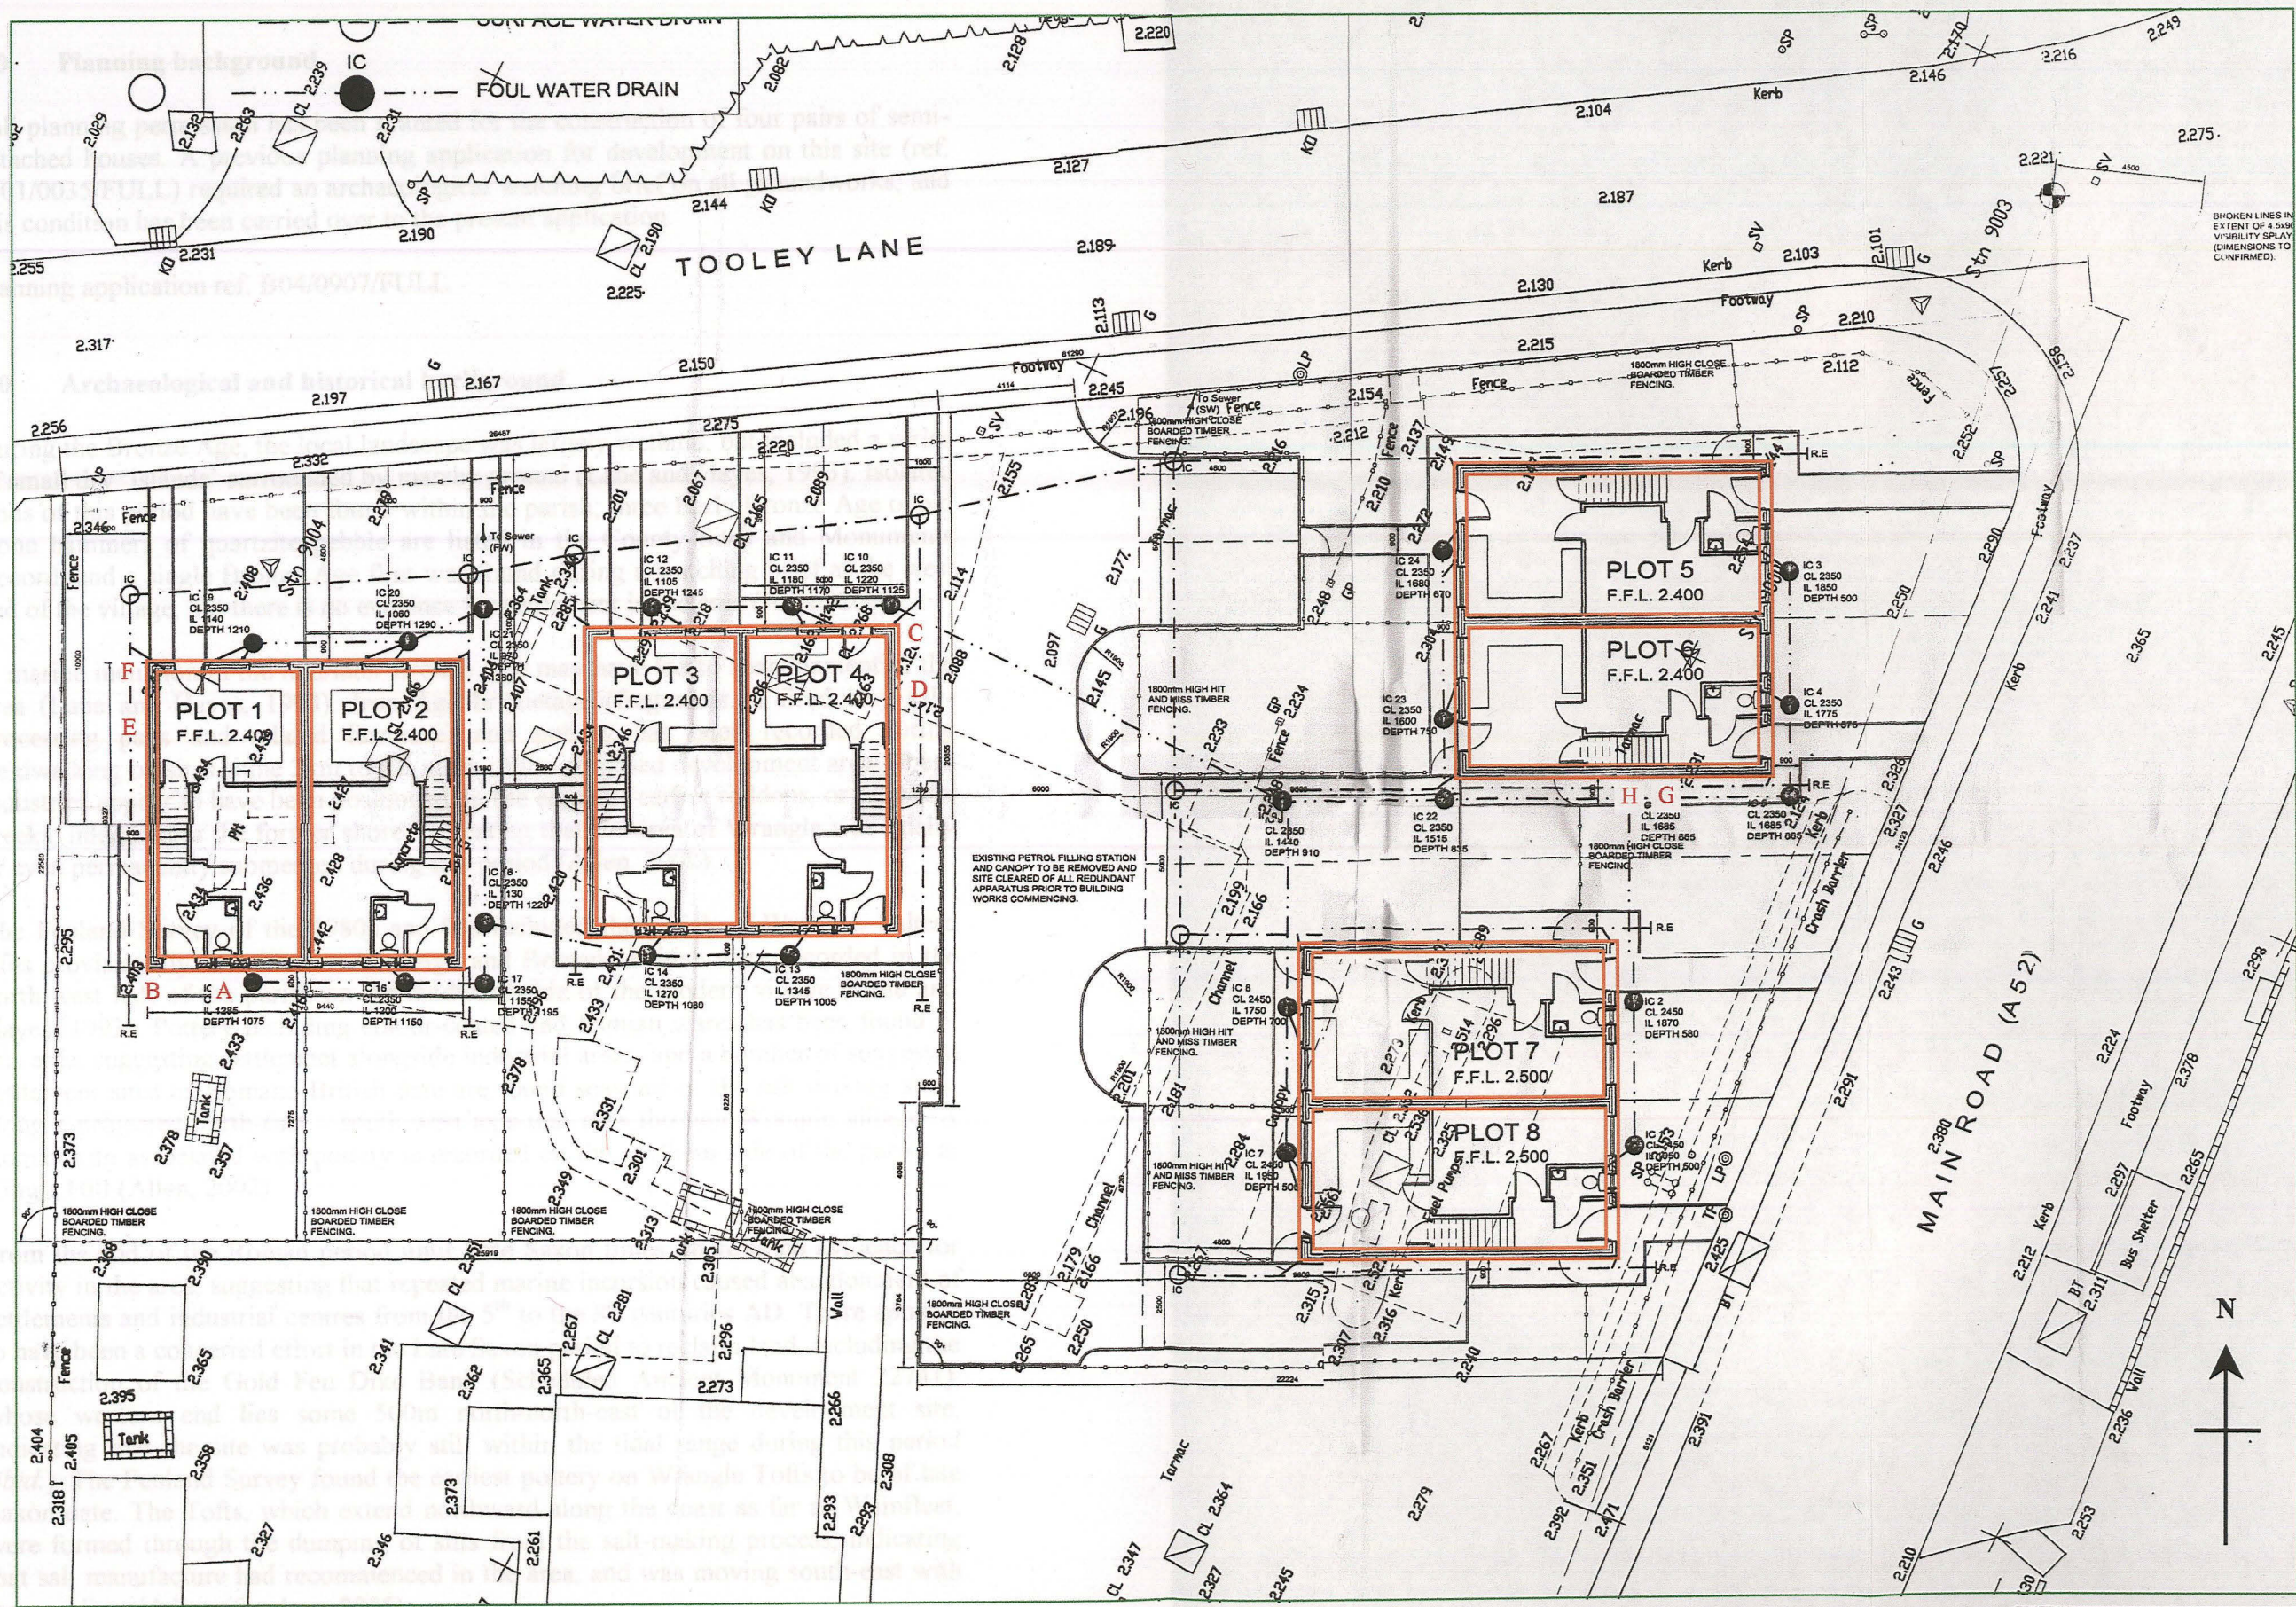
Plan of the development site at scale 1:200. The foundation trenches watched are shown in orange, and the location of drawn sections in red. Plan supplied by developer.
